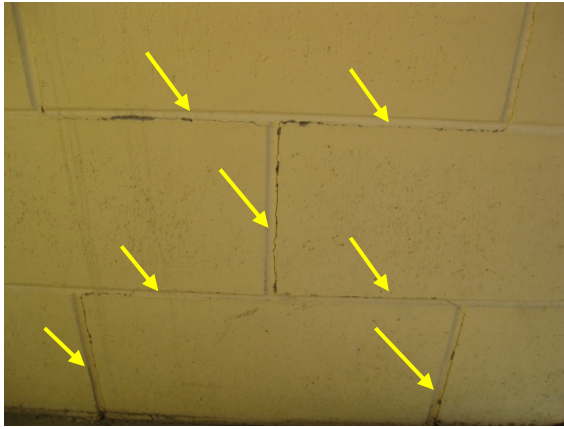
Close up of Photo 8 (Eastern Return Wall - 1)
